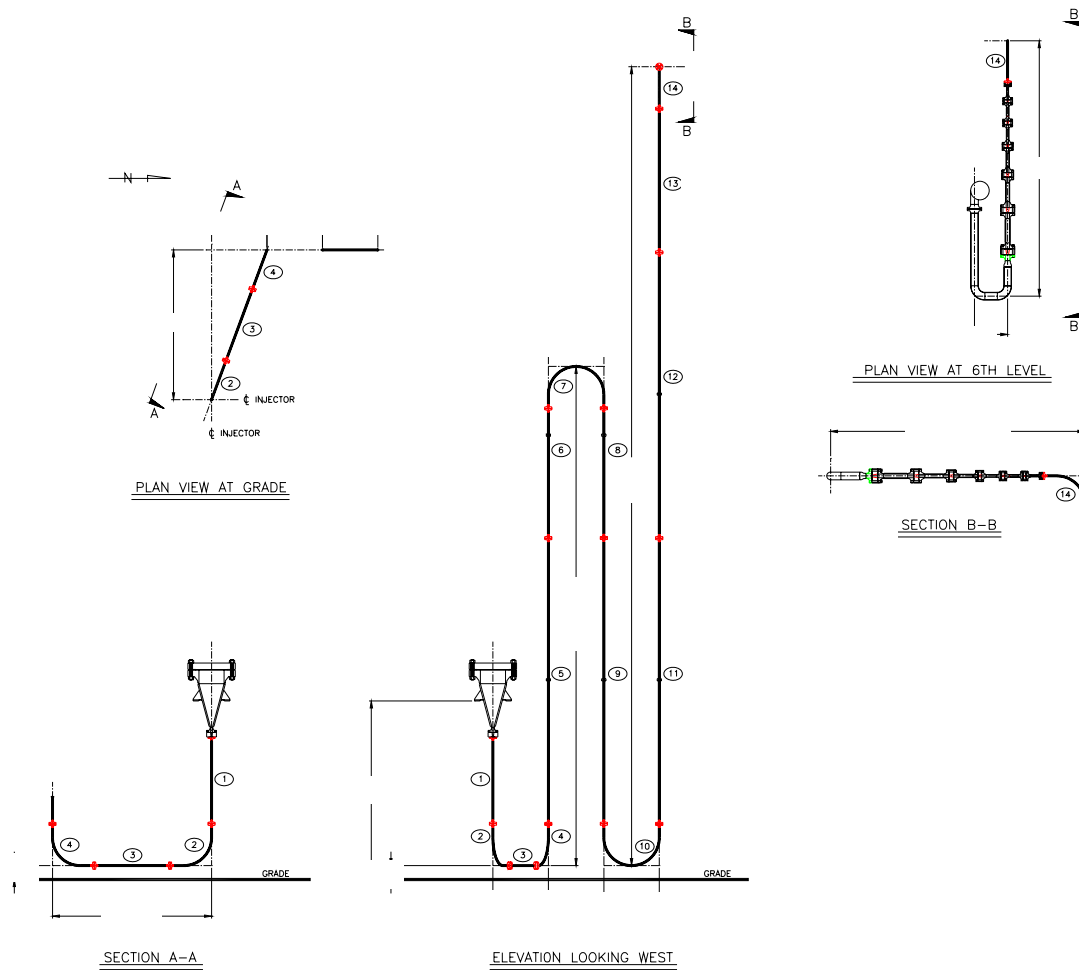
1-1/4" Sch. XX Injector Discharge Dump Line (Drawings 7R109704, 705, & 706)
